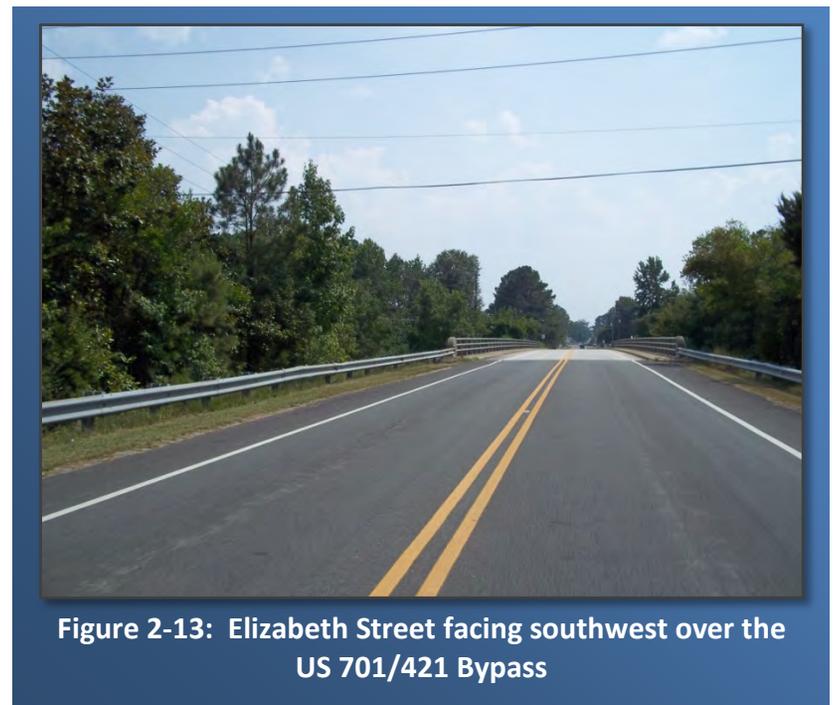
Elizabeth Street facing southwest over the US 701/421 Bypass
